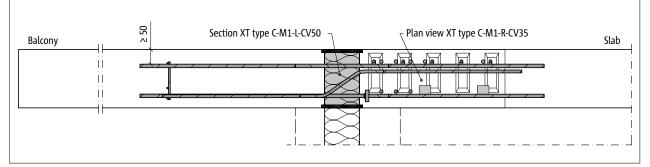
Schöck Isokorb® XT type C: Outer corner with non-load-bearing cavity wall masonry (view XT type C-L-CV50; section XT type C-R-CV35)
